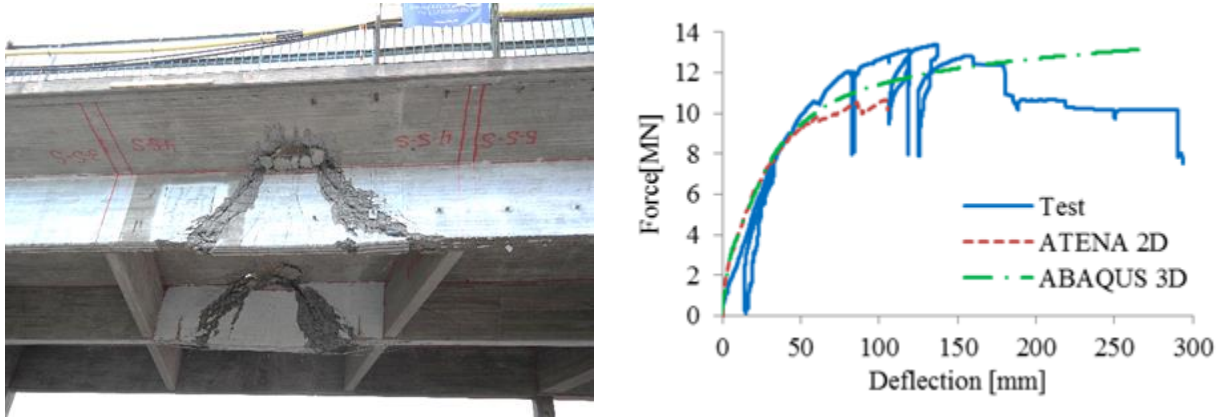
Kiruna bridge girder failure. (a) Photograph of the girders after test. (b) Load-deflection curves for the failure test of the bridge girders. (13.4 MN = 3,055 kips, 200 mm = 8 in).
